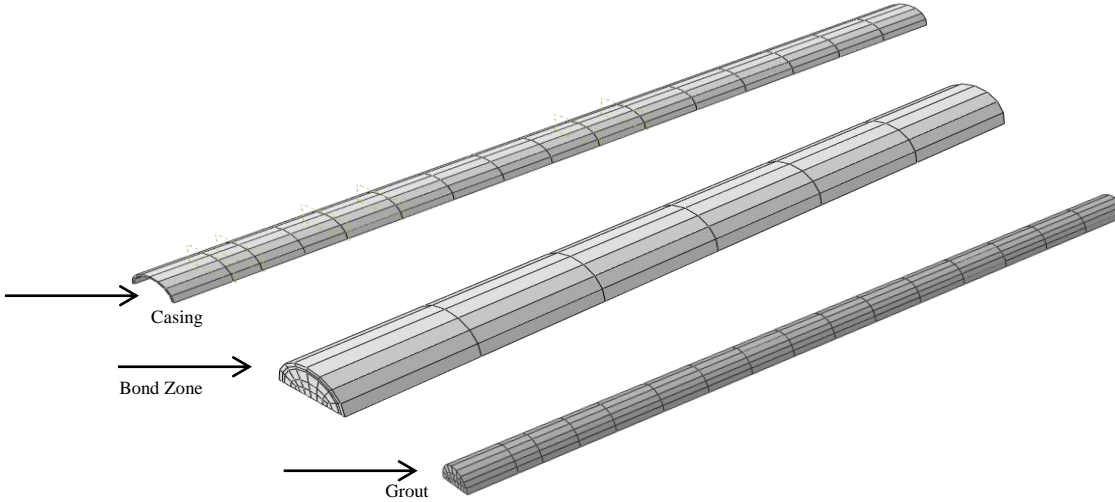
Mesh of (casing, bond zone and grout inside steel pipe).
